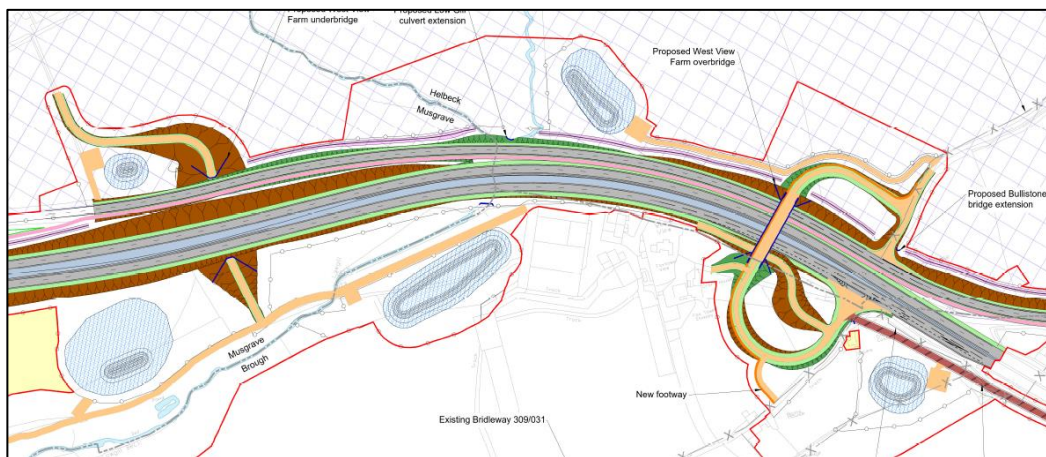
(a) Extract from General Arrangement Drawing (Before)
